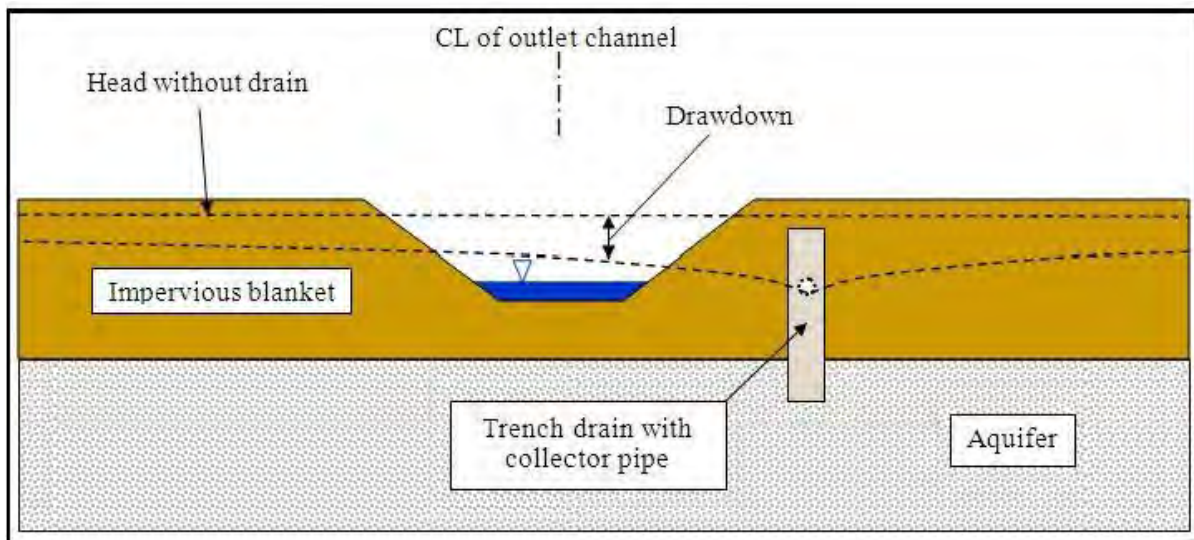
Trench drain parallel to outlet channel of dam at Canby Creek, R-1 Dam.
